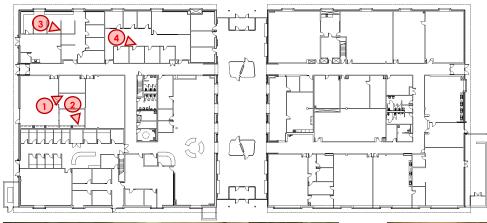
hows the progress of the masonry block wall that will separate the building storage and Innovation Lab Storage rooms. This one of several new walls that the masonry crew will be installing in the next few weeks. Photo #2 shows the metal stud framing in the new preparation area for the Innovation Lab. This wall will be lined with casework (cabinetry) upon completion. Photo #3 highlights the progress of the wall framing for the new Information Systems Office Suite. All the full height walls in this space have been built. Photo #4 shows the beginning of the metal stud framing for the Business Division Office Suite. About half of the walls in this area have been framed already with the rest being completed by end of next week.
